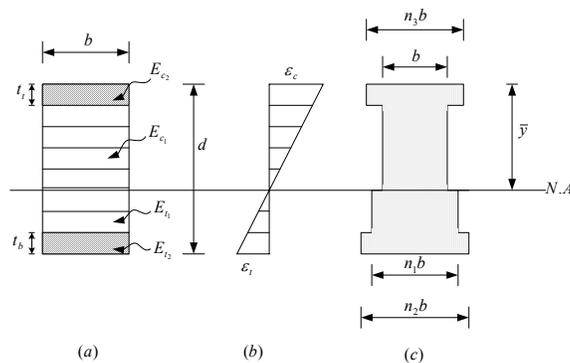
Sandwiched Girder: (a) Typical Cross-Section; (b) Transformed Section.
